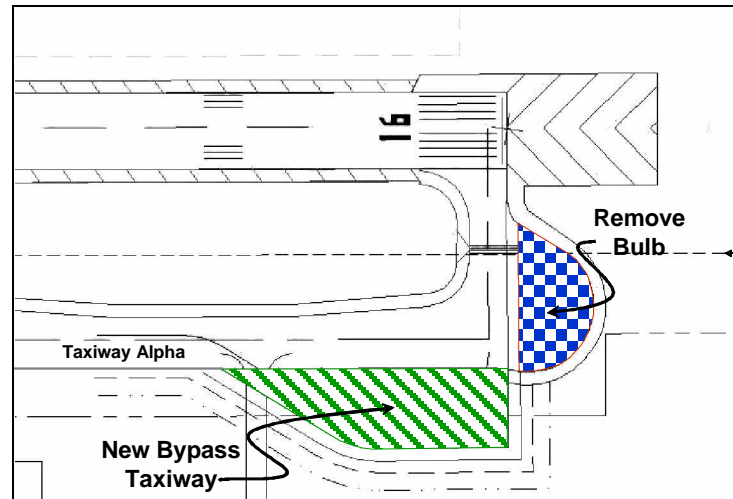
Proposed Bypass Taxiway at the Runway 16 End.
